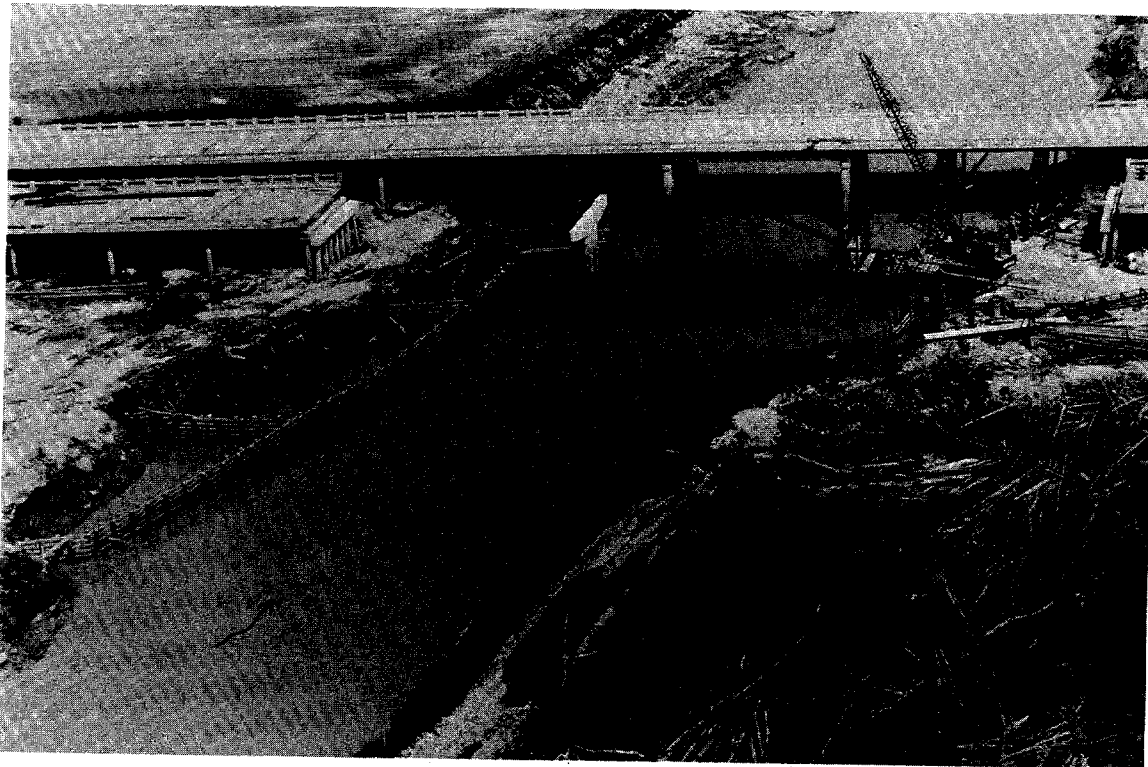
Aerial oblique view on June 3, 1975, showing reconstruction of upstream bridge, US-51 at South Fork Forked Deer River. (From Tennessee Dept. of Transportation.)
